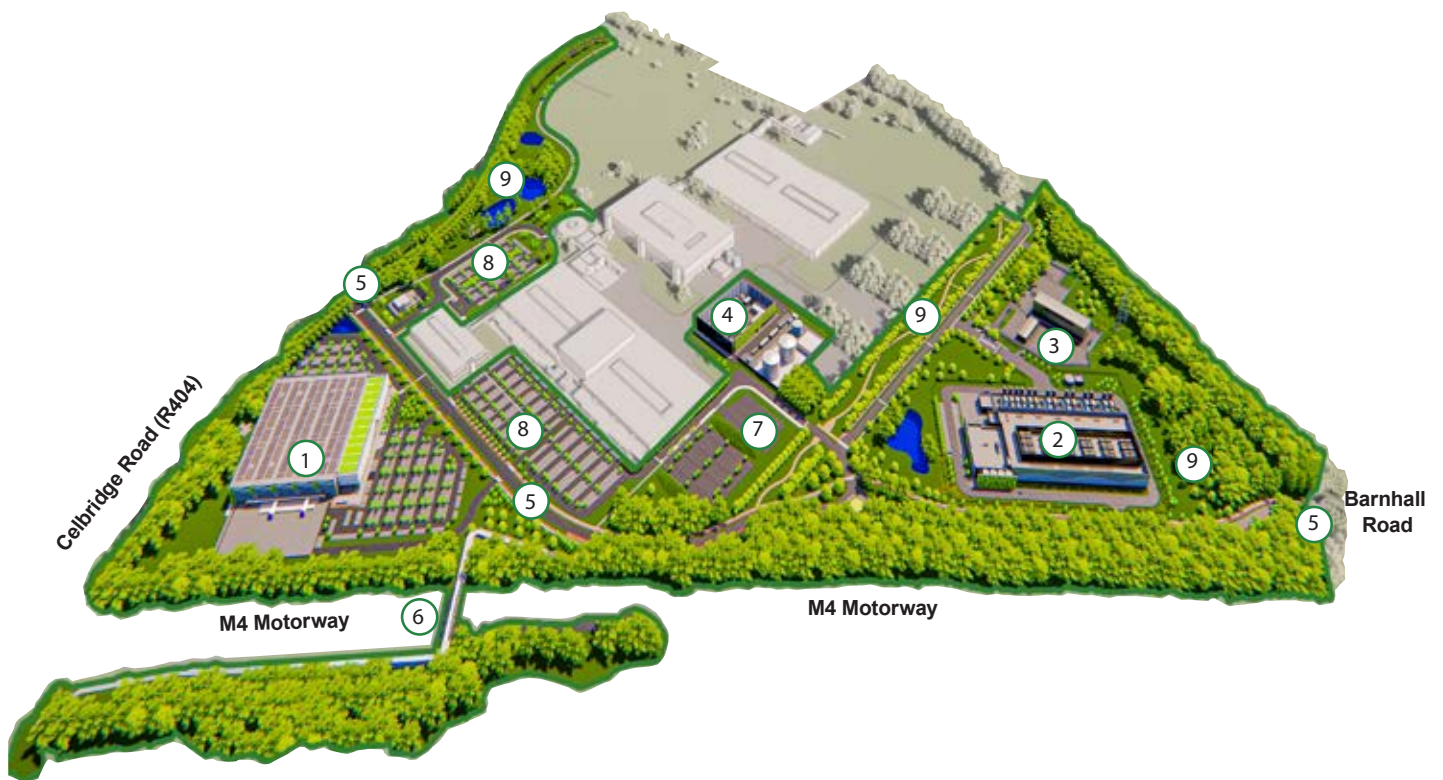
Kildare Innovation Campus Phase 1 Plan (Green Outline). Source: RKD Architectural Design Statement
